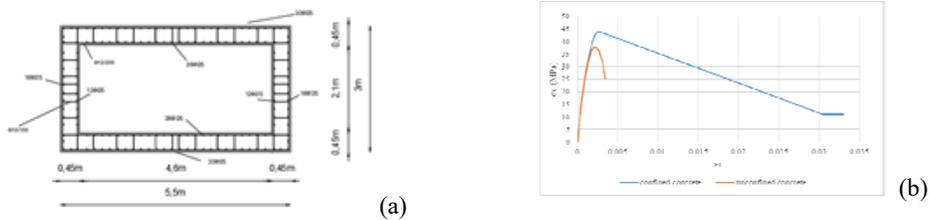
(a) Pier reinforcement (b) Stress-strain curves for the confined and unconfined concrete of the pier
